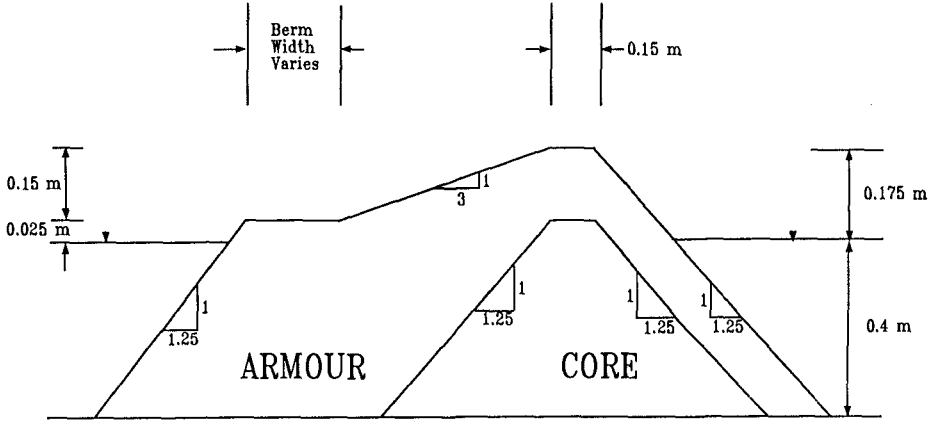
DIMENSIONS OF TEST STRUCTURE
